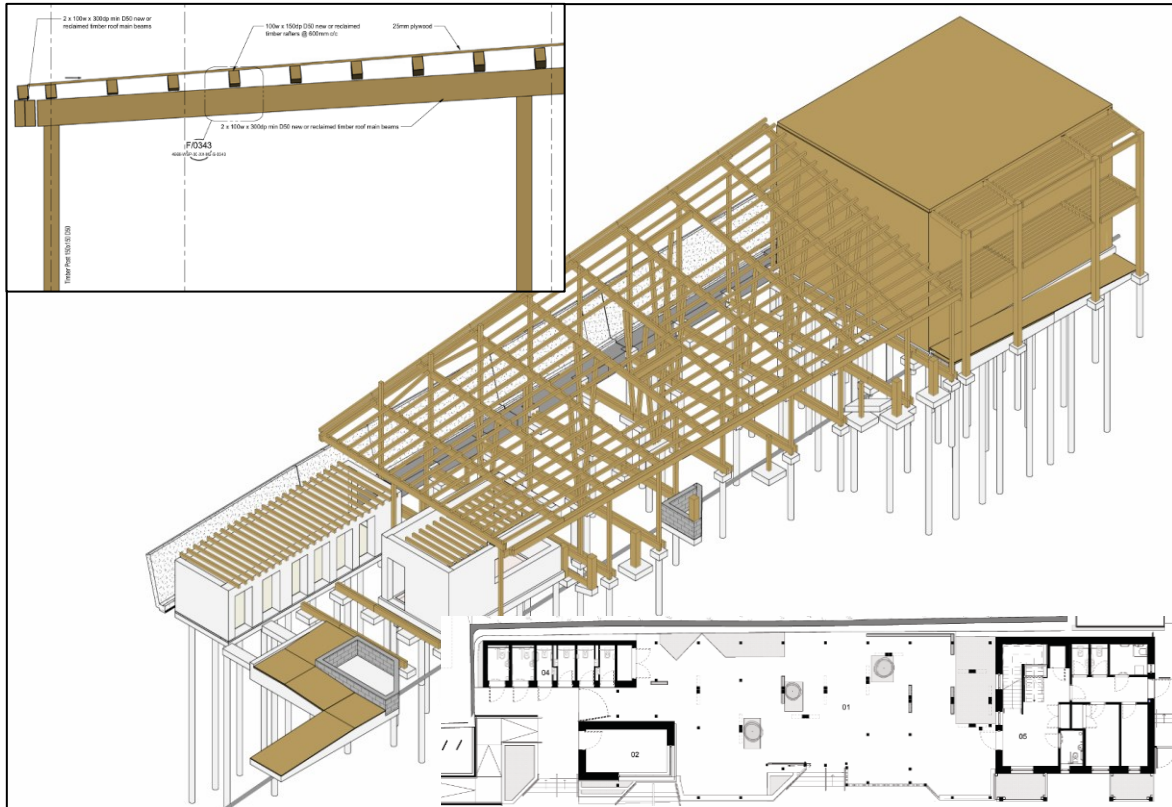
Structural isometric view and Detail of canopy roof isometric view, drawing by WSP. Ground floor plan showing exhibition space, kiosk, WCs, and education space, drawing by Footprint Architects [135]
